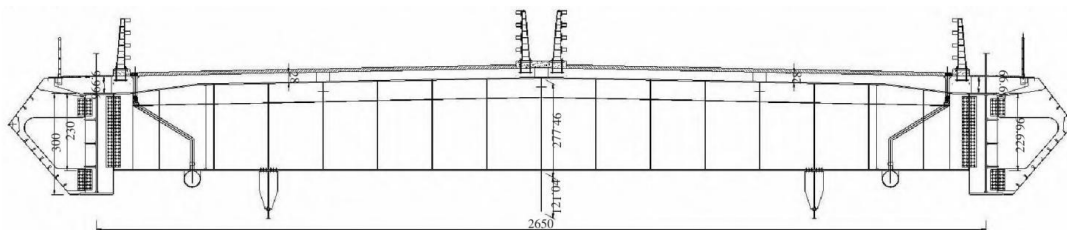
Sectional diagram of composite beams of Li Xianjiang Bridge [9].
